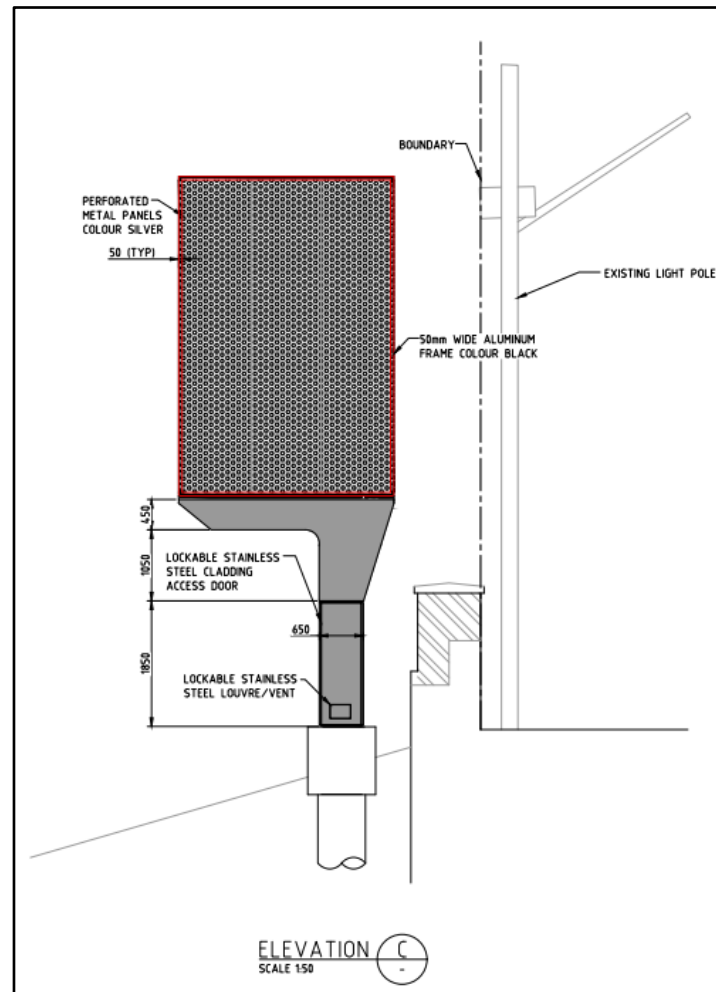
| Elevation C of proposed signage (Source: Dennis Bunt Consulting Engineers)
